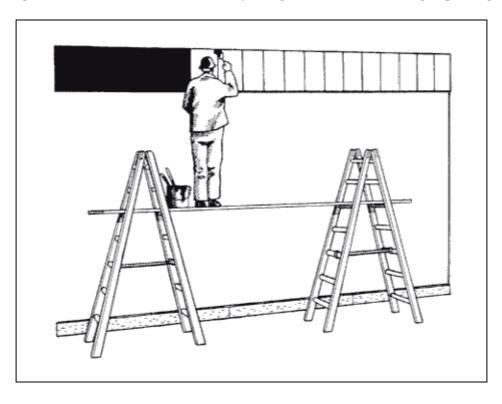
A trestle scaffold suitable only for light work such as cleaning or painting
